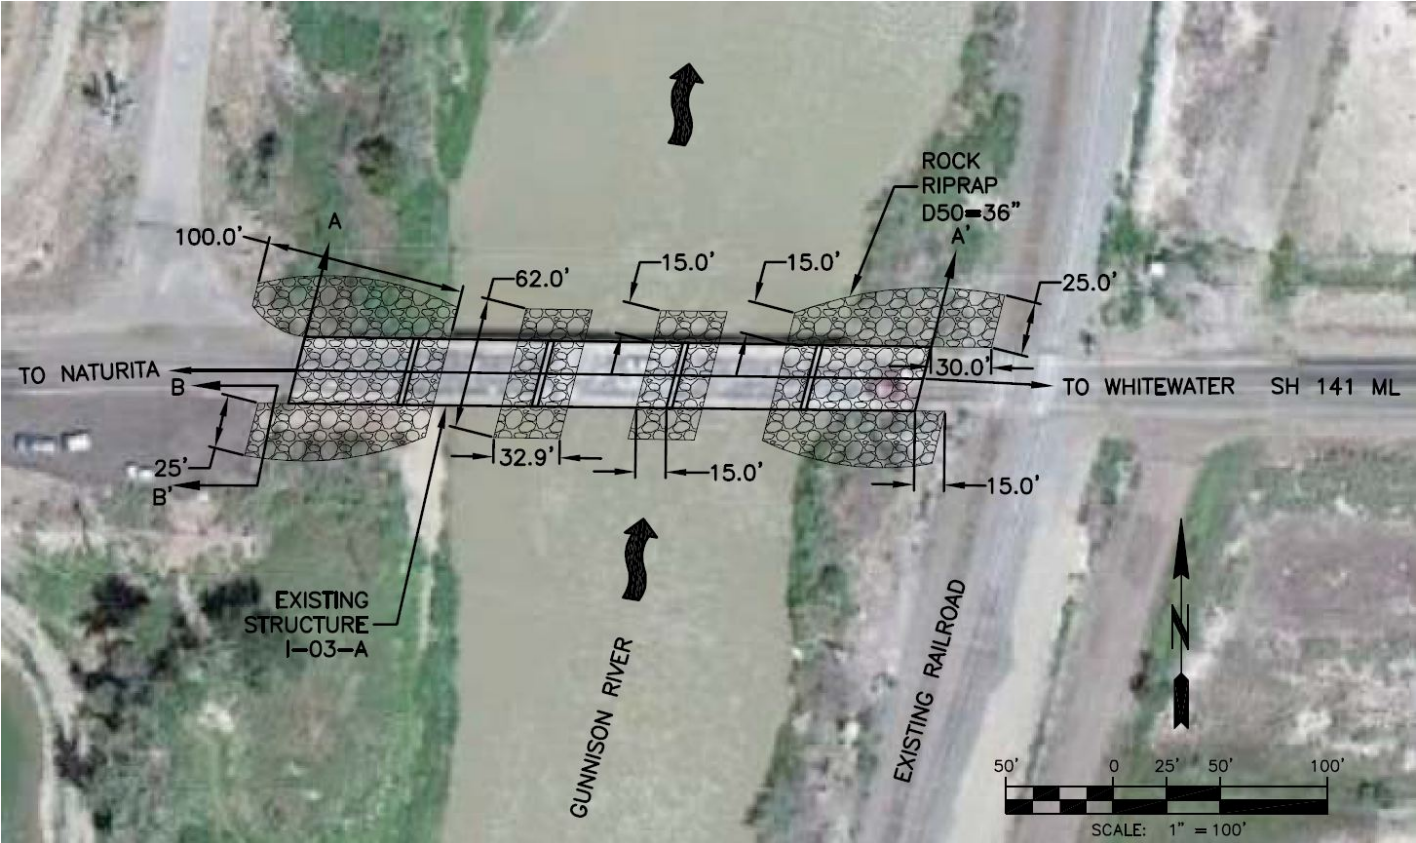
Plan view of Bridge I-03-A with recommended hydraulic scour countermeasure locations
